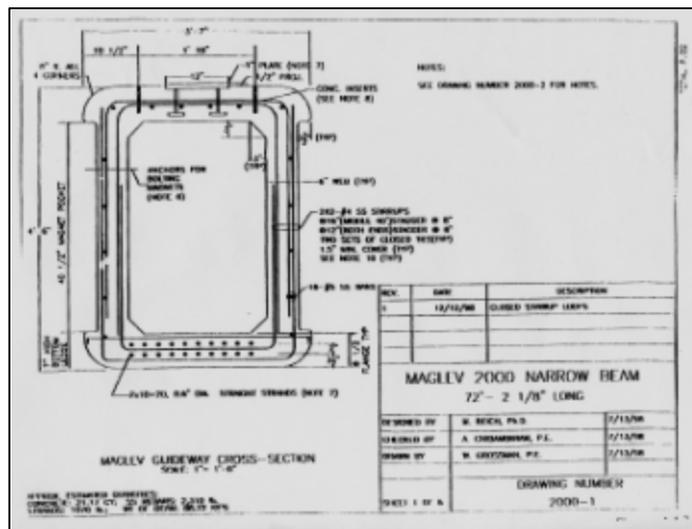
Design for 72 Foot Long Monorail Guideway Beam
